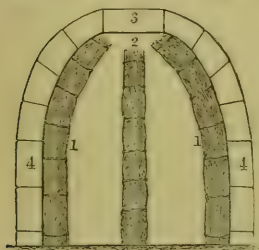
Straw lining: 1, central straw column; 2, central straw column; 3, aperture; 4, masonry.
